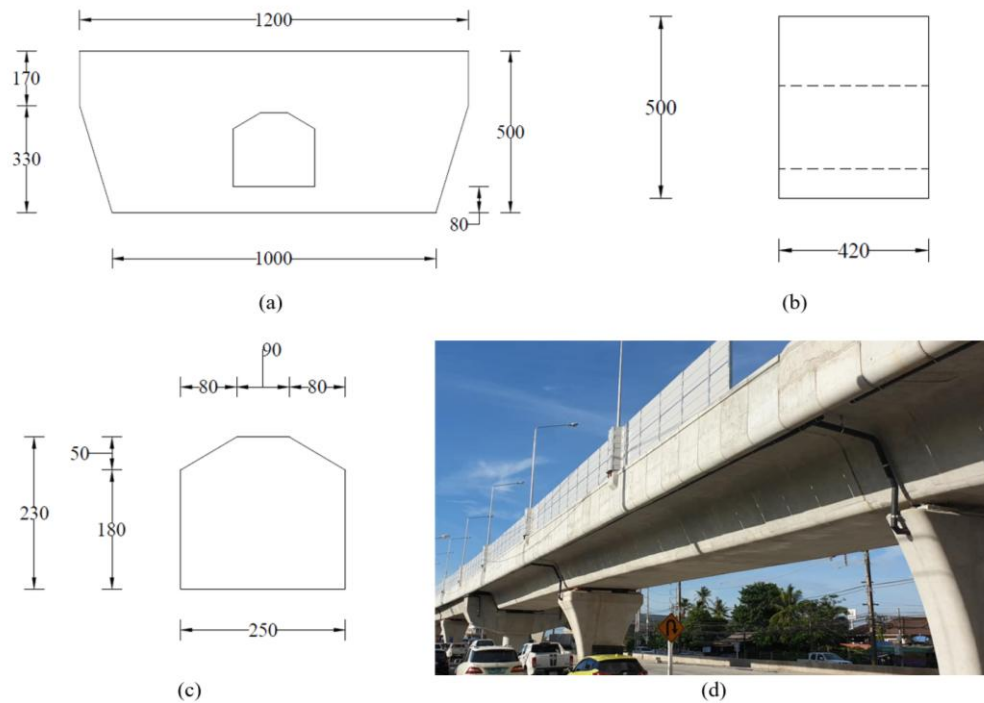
Typical specimen geometry (a) front elevation of tested segment, (b) side view, (c) opening details and (d) typical construction of highway route No. 304 (units in mm).
